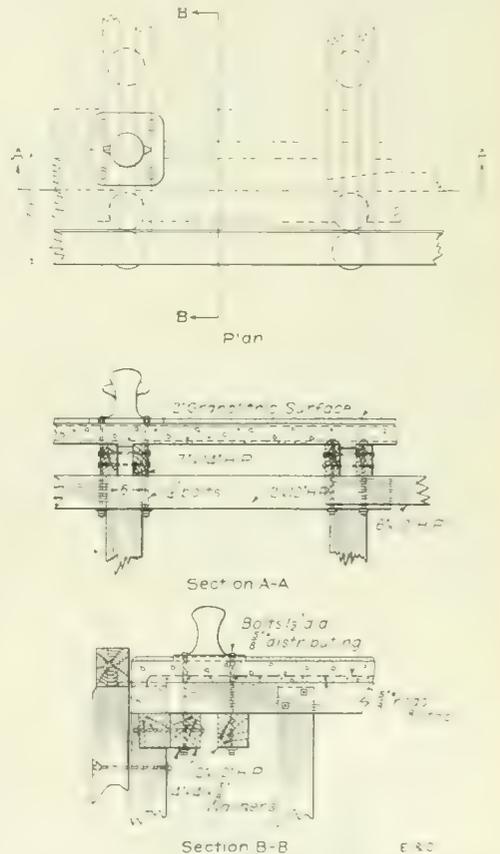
Plan and Sections of Wharf Platform of Commonwealth Pier No. 1. Showing Details of Construction.
